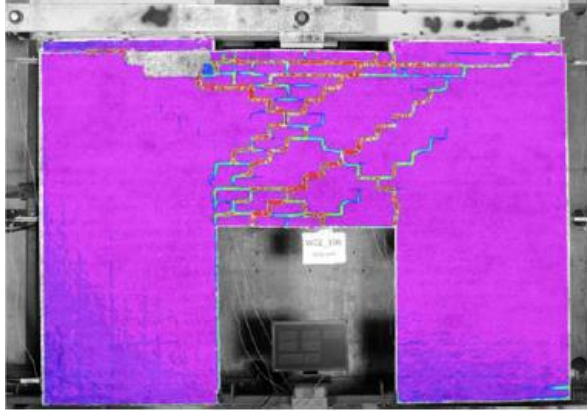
Unreinforced masonry wall specimen with door opening (Allen et al, 2016)
